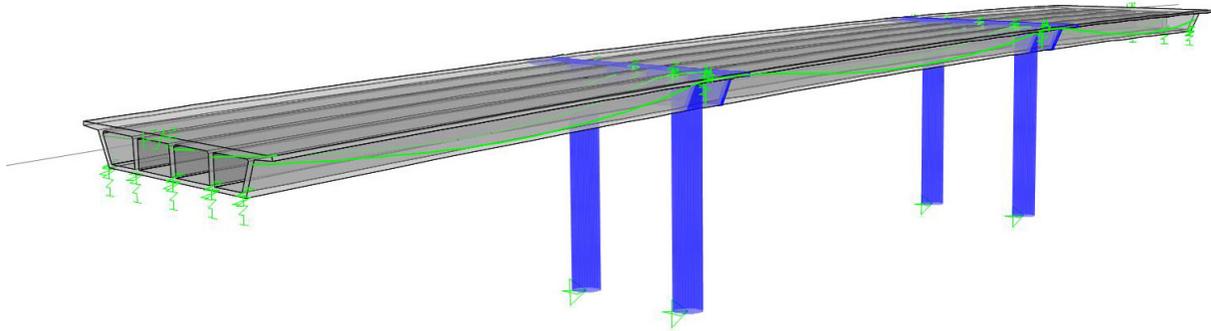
3-D CSiBridge Model for Bridge Example
